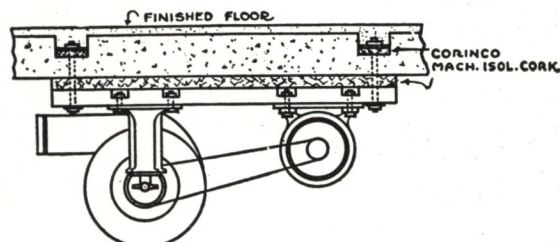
SMALL SIZE MOTOR MOUNTED ON CEILING SLAB.
